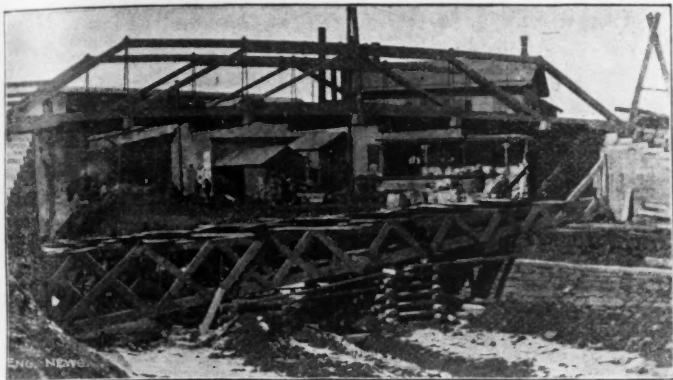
VIEW SHOWING SINKING OF VERTICAL WALL AND MANNER OF BRACING BRIDGE ABUTMENTS TO PREVENT SLIDING.
